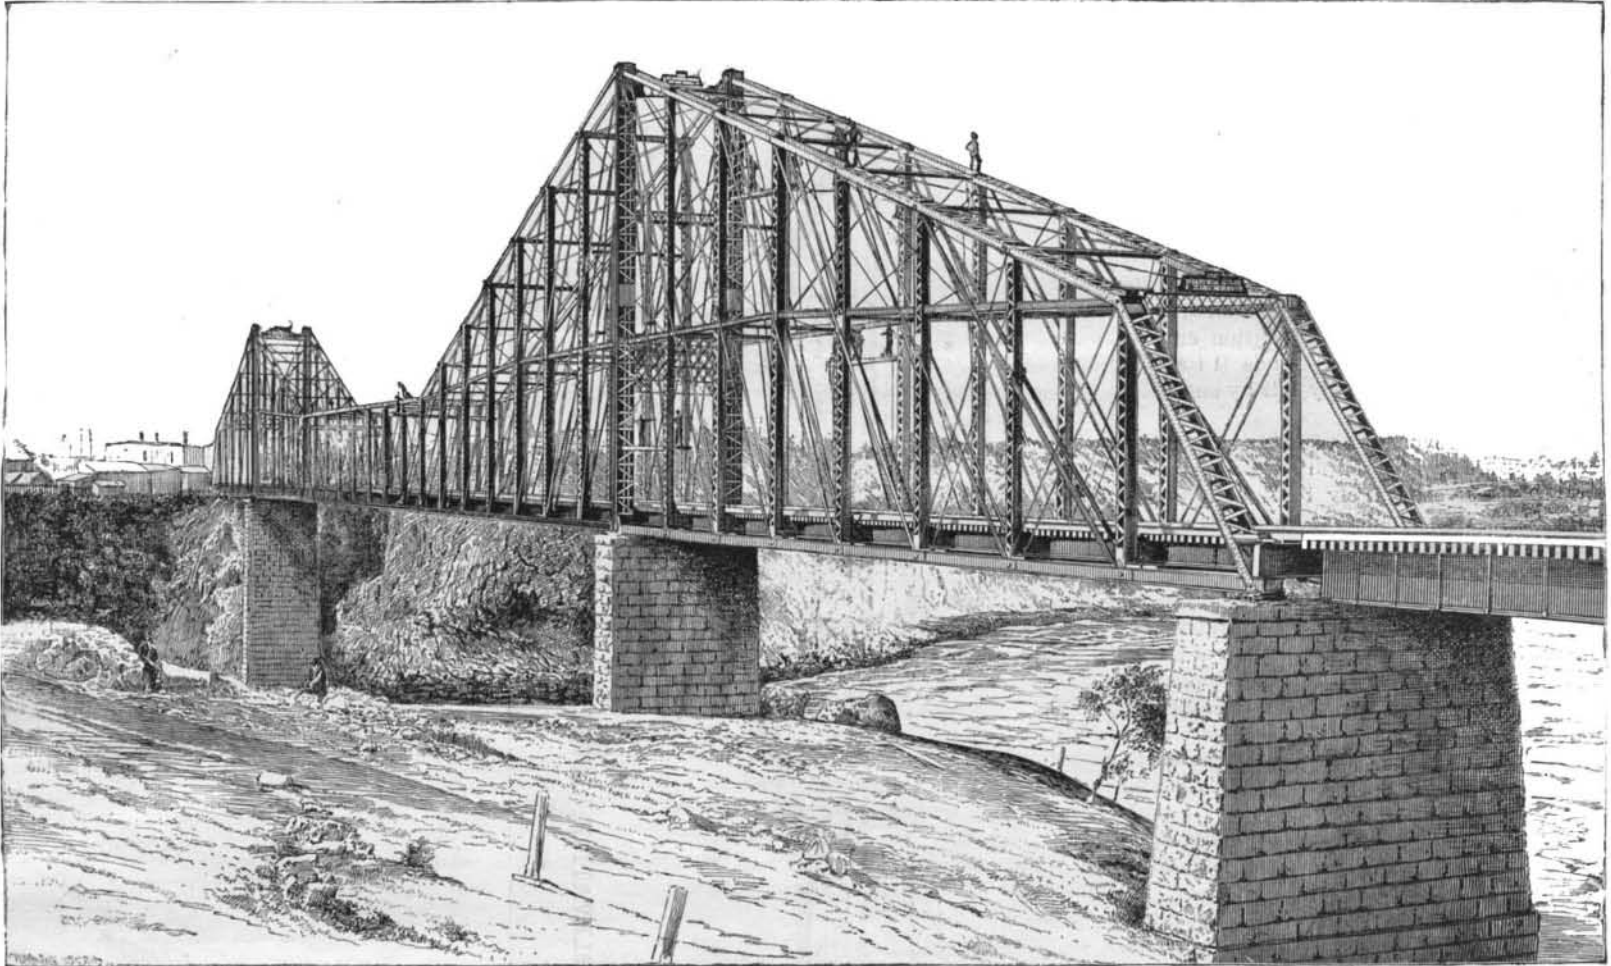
STEEL CANTILEVER BRIDGE OVER THE ST. JOHN RIVER, AT ST. JOHN, N. B.—VIEW FROM WEST END.
